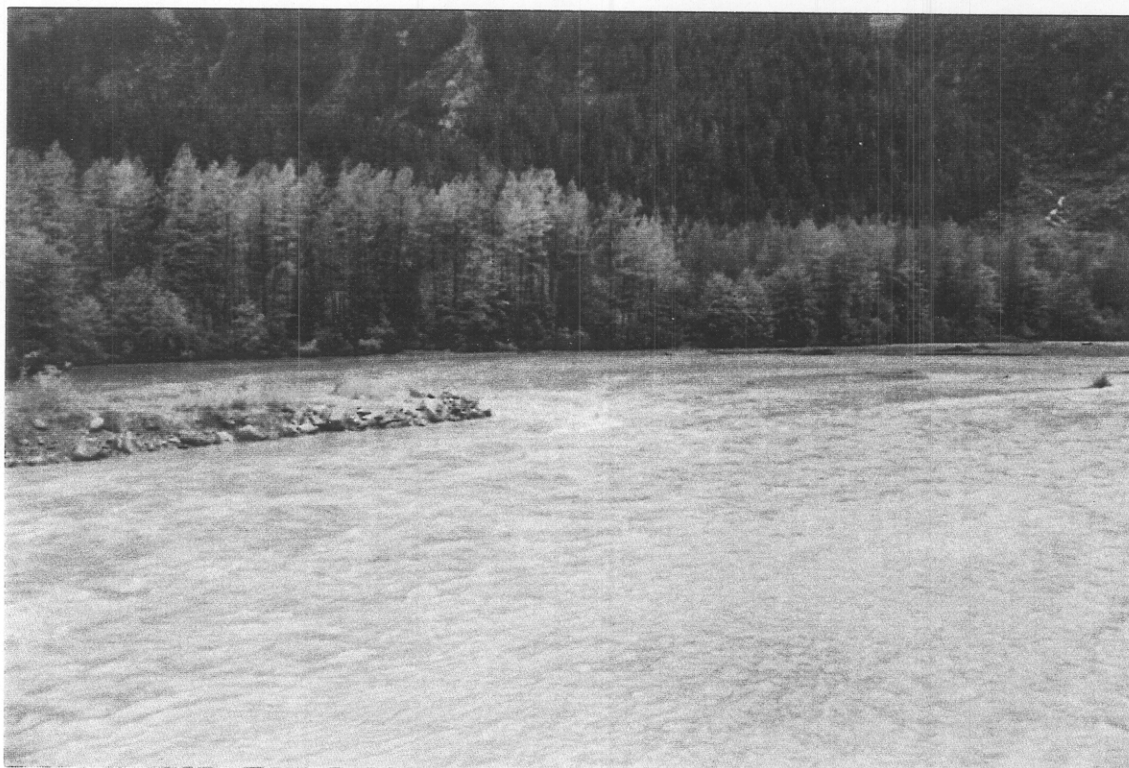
BEAR RIVER LOOKING UPSTREAM FROM BRIDGE AT RIGHT BANK ROCK GROYPE
